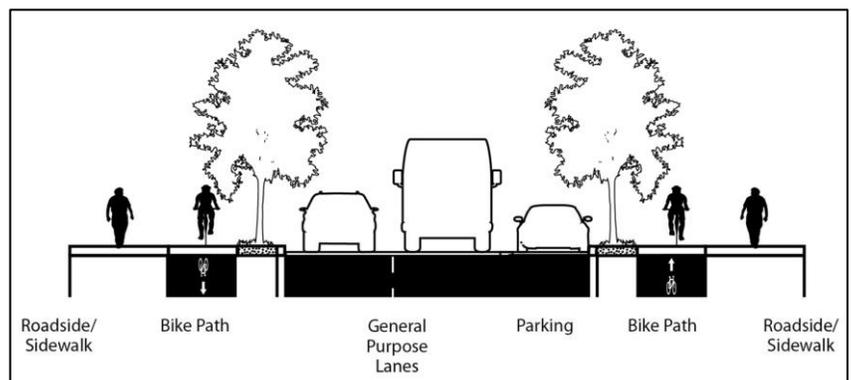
Off-Street Bike Paths Cross Section (Source: TAC, 2017)
